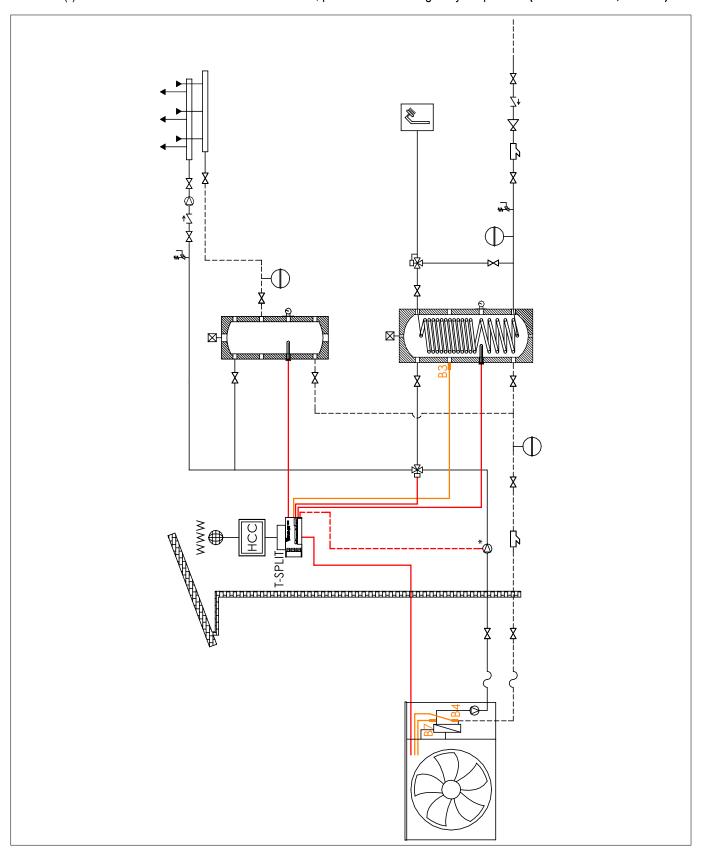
(Heating/cooling plant + DHW - "TEE" layout)
